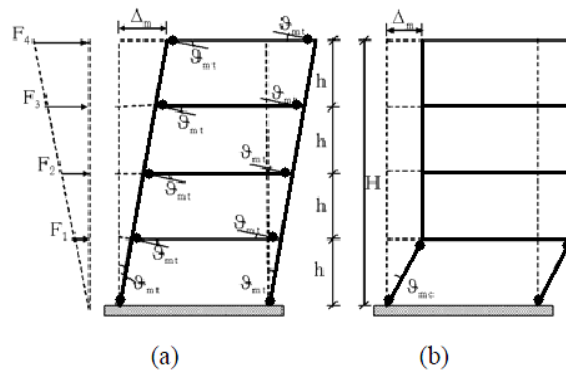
(a) Beam-sway mechanism and (b) Column-sway mechanism for RC frames
